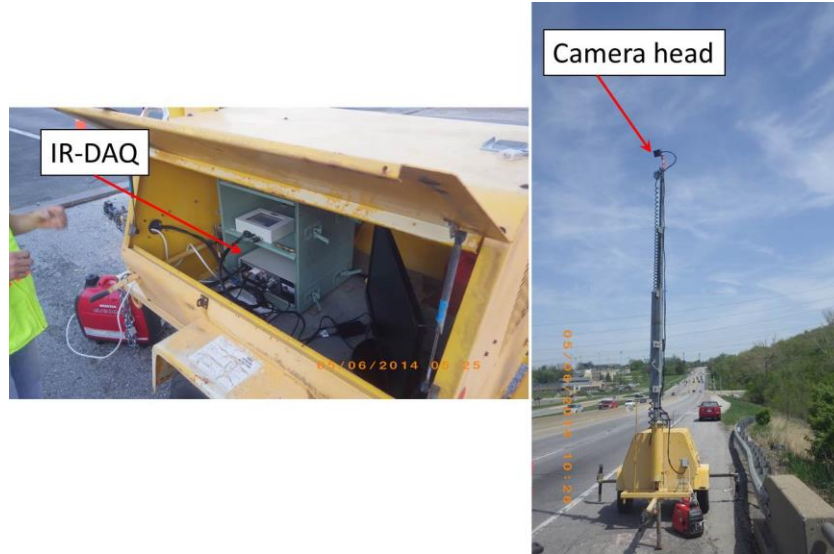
Mounting of the IR-UTD system for the testing the Providence Road Bridge.
